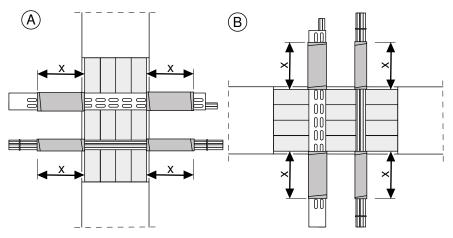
Fire protection bandage on cables in wall (A) and ceiling (B)
